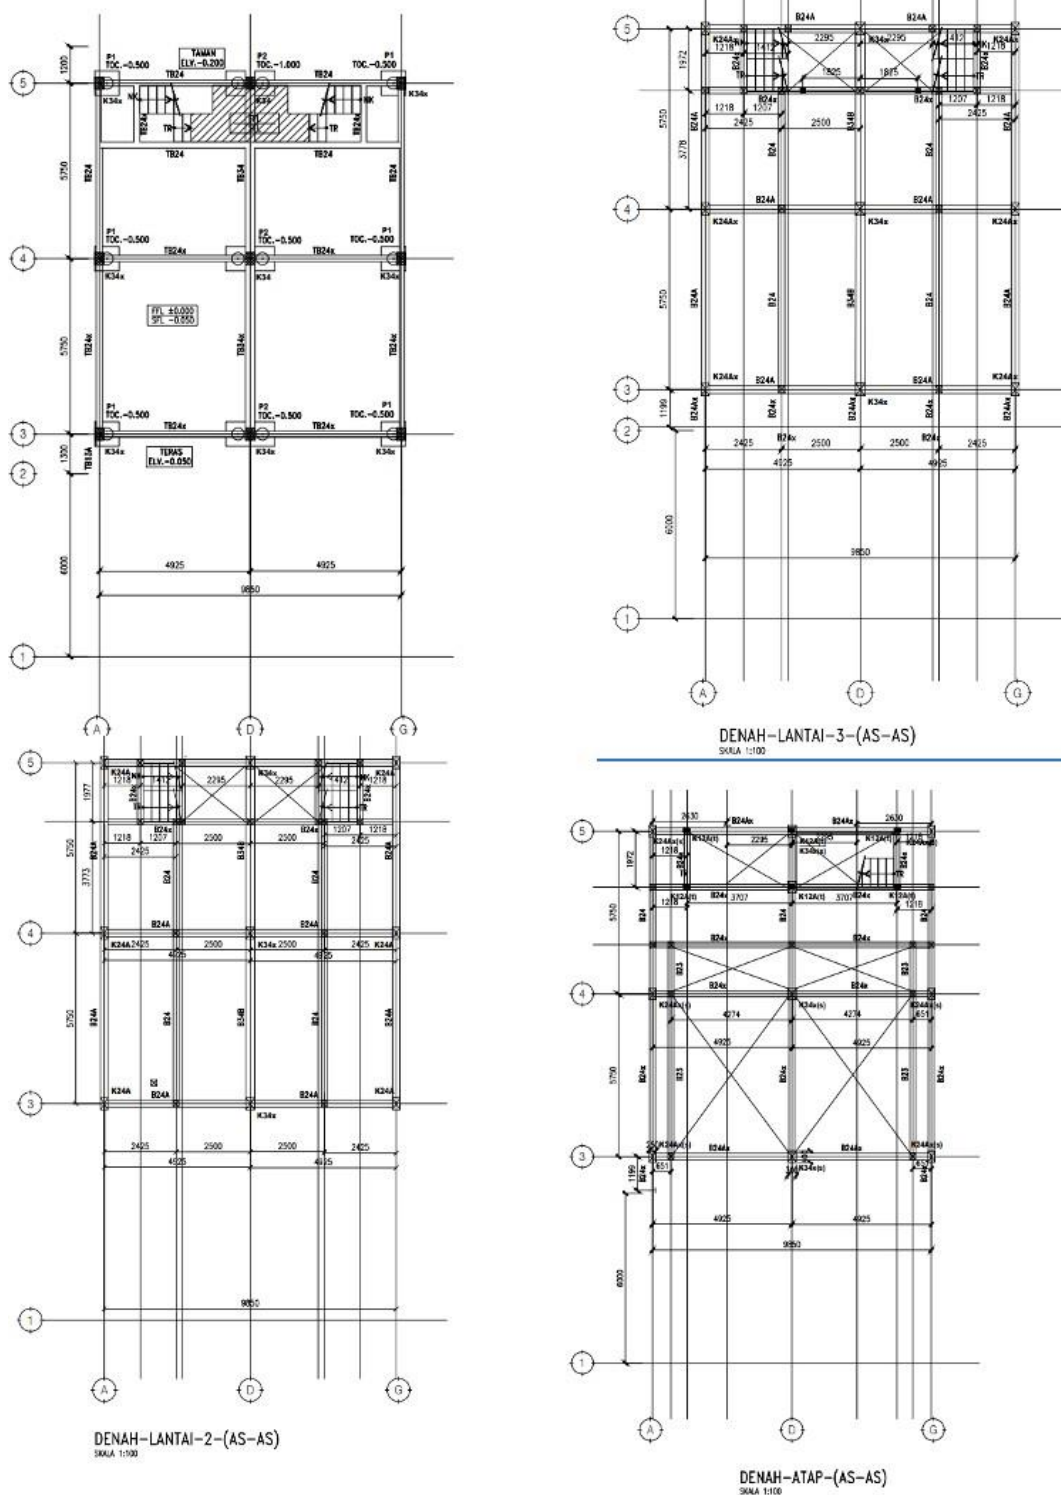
Foundation plan/Ground Floor, 2nd Floor, 3rd Floor and Roof on Autocad drawing
